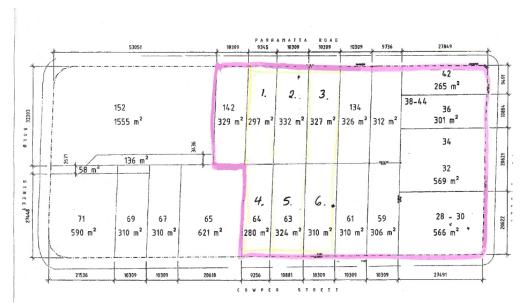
Site plan - cadastral plan areas, June 2010. (Source: The Client)
